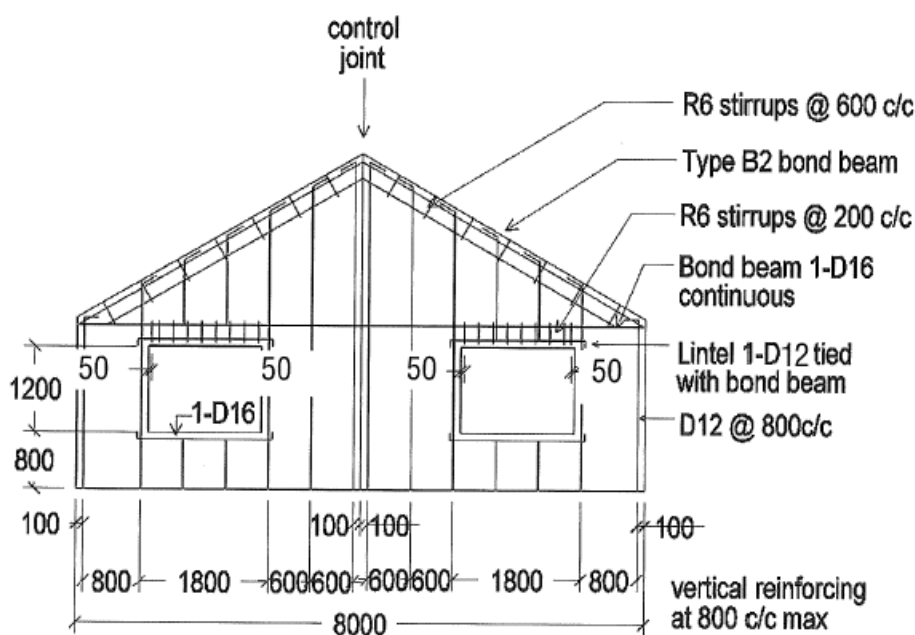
Bond Beam and Lintel Reinforcement for West Wall (Bracing Line B)
